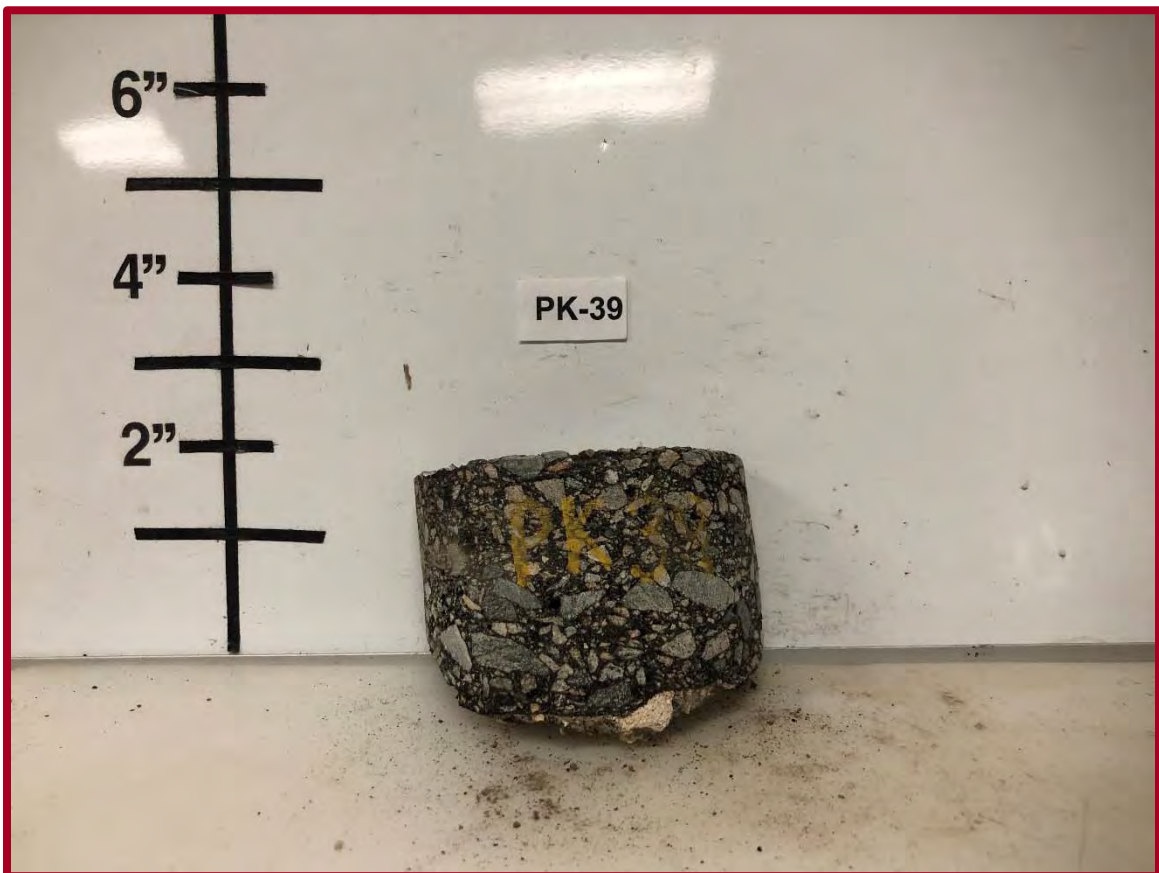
PHOTOGRAPH OF PAVEMENT CORE PK-39
